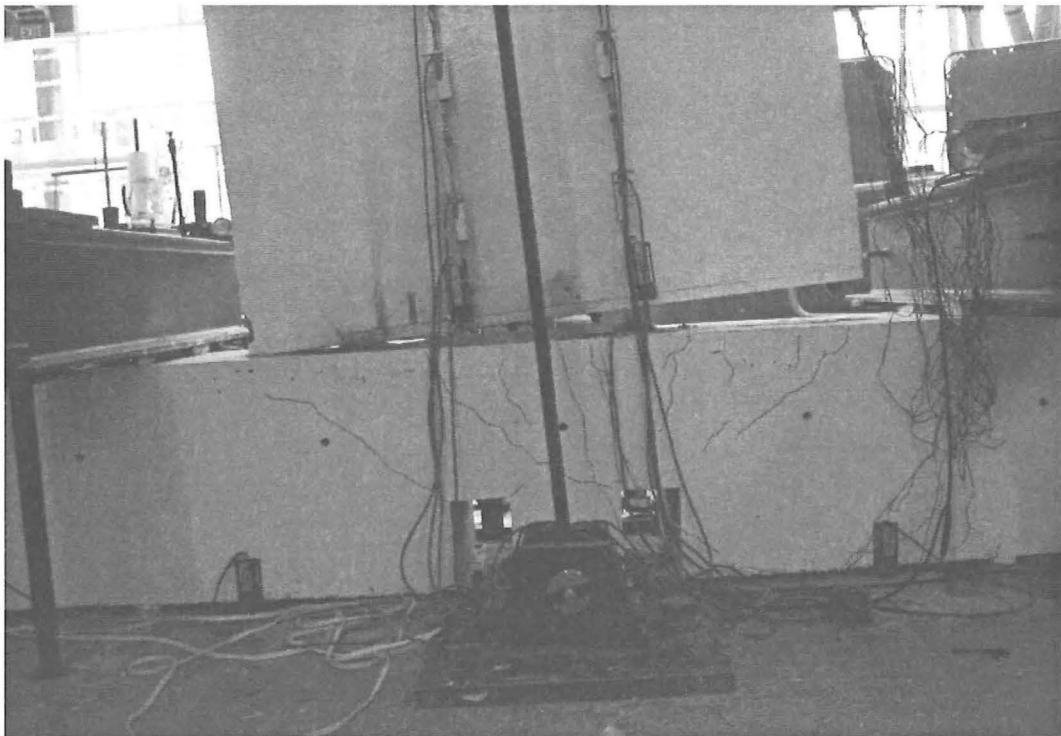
Unit 2 foundation beam crack pattern at +5.0x1.
